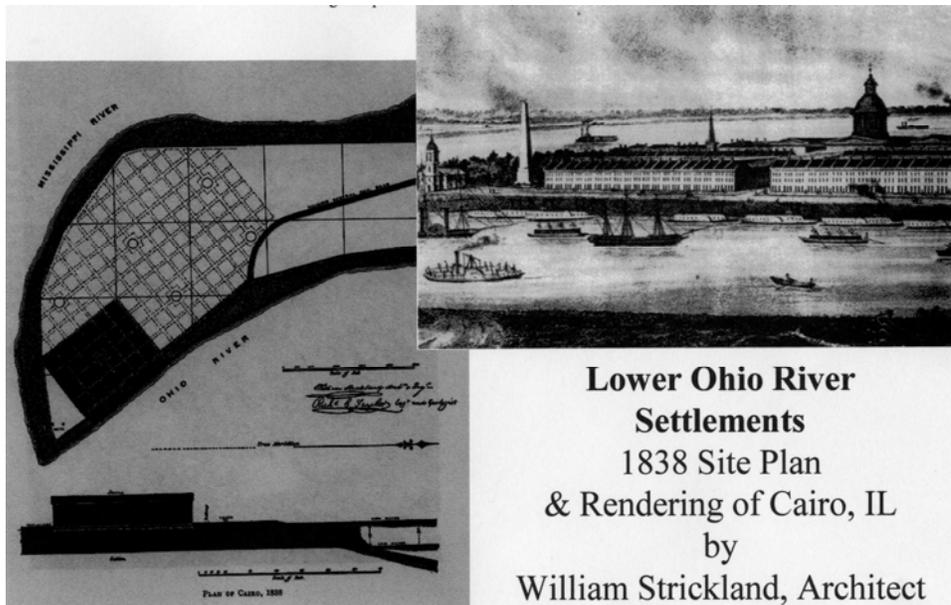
1838 Cairo Drawings by William Strickland, Architect
